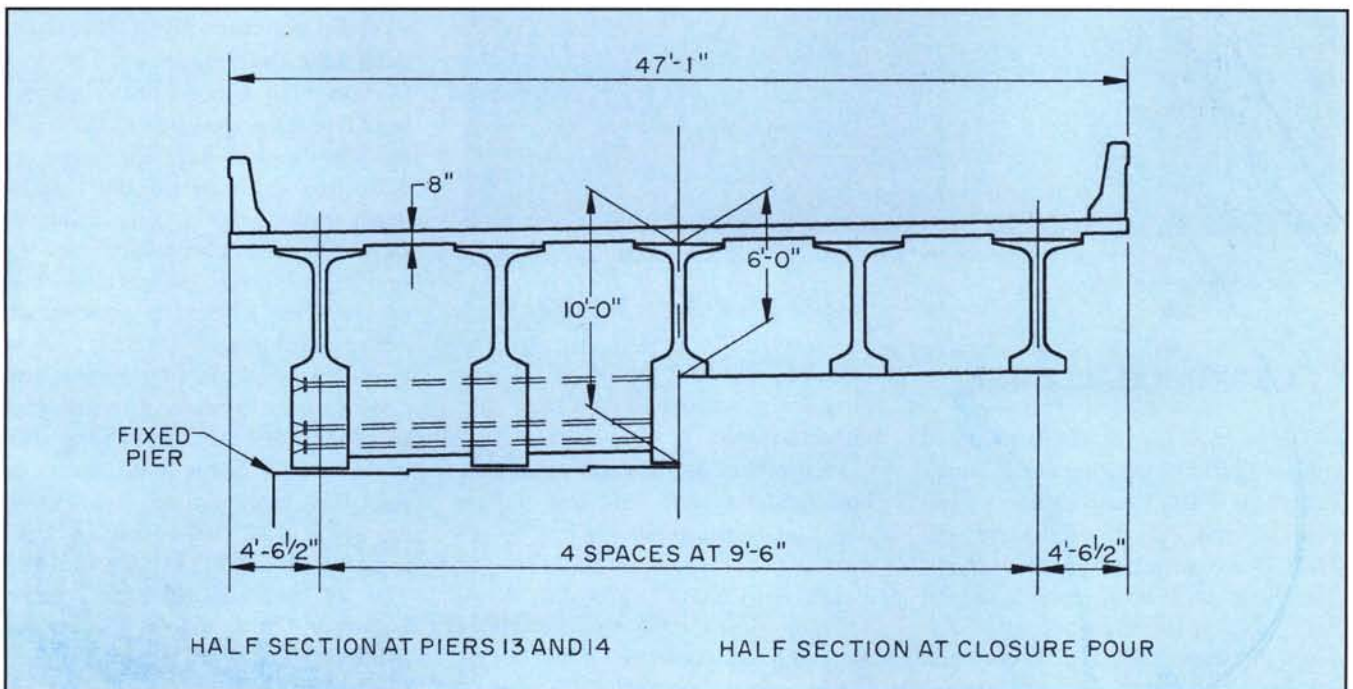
Half-section of deck width showing the configuration and major dimensions at the piers and closure joint.
